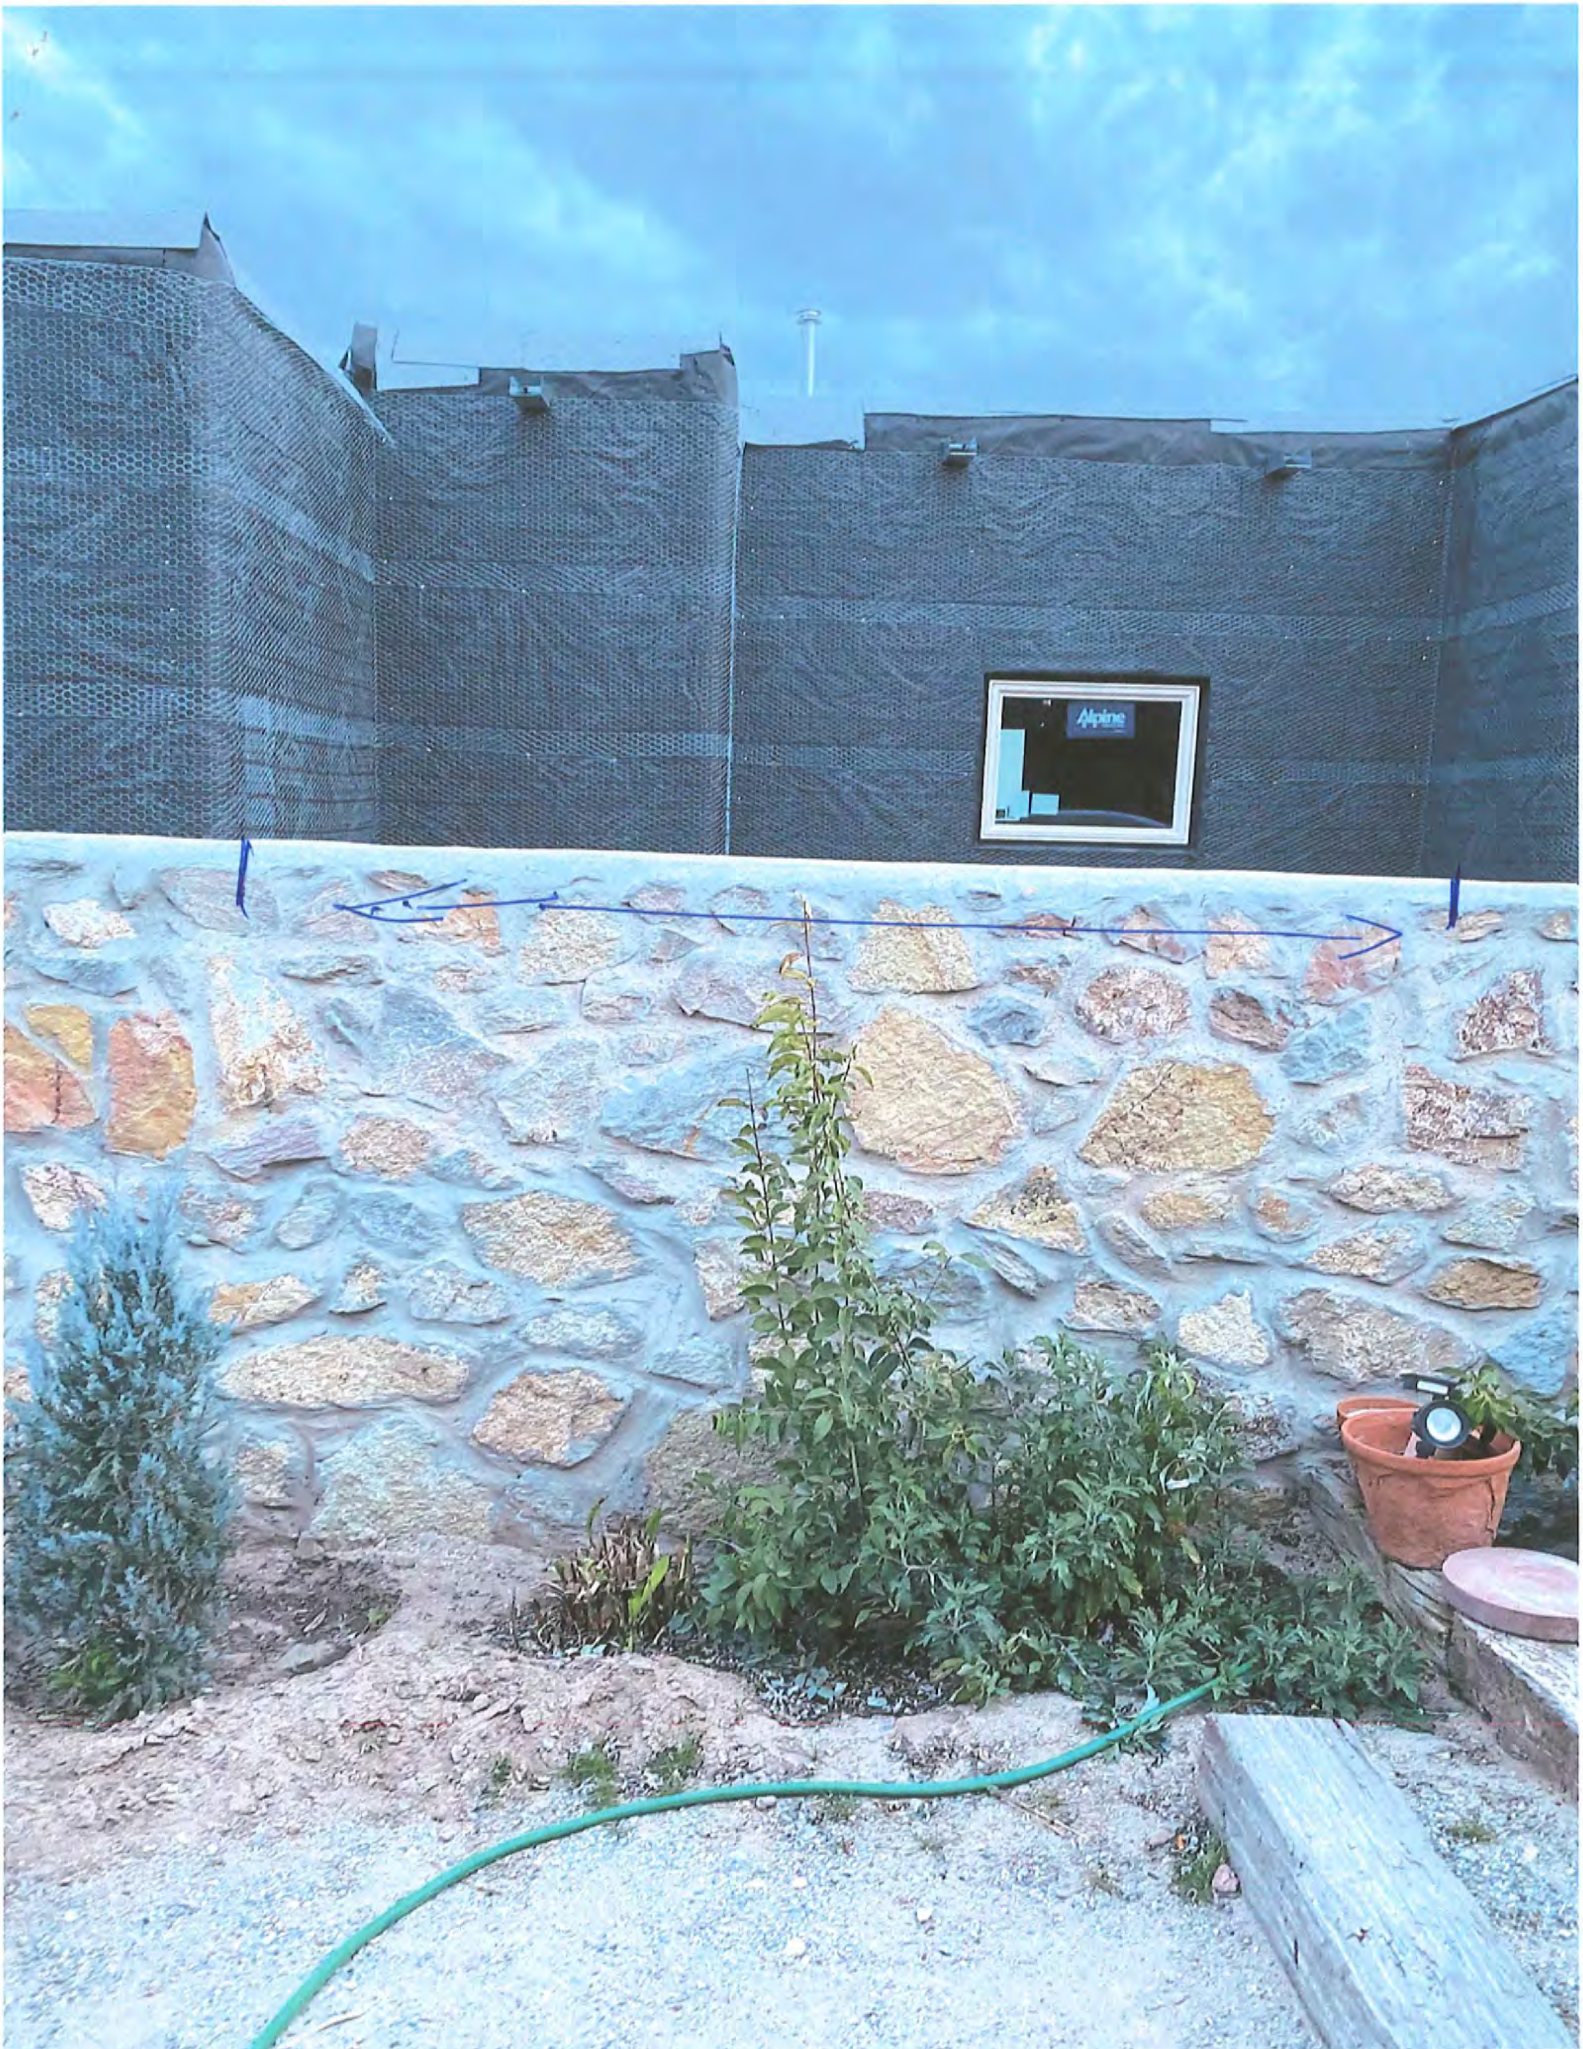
PHOTO OF THE NEIGHBORING DWELLING AND ROCK WALL
